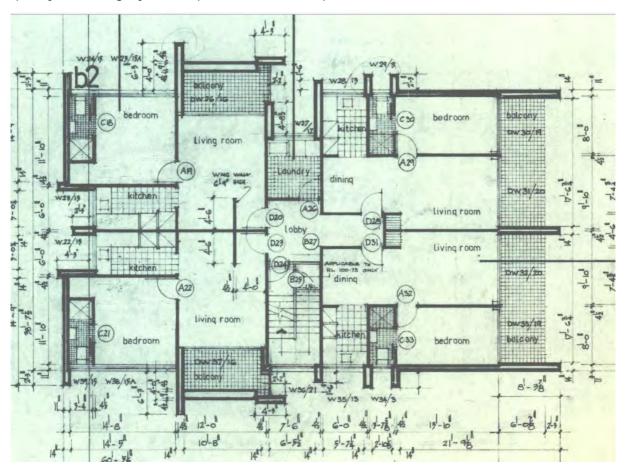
Submitted architectural drawings, 21C Billyard Avenue typical floor plan (detail), 1972 showing the one bedroom apartments. The expression of the brick fin walls is the plan is notable, along with the careful articulation of balcony spaces with privacy screens and planters. (Source: City of Sydney Archives, A-00590018)
